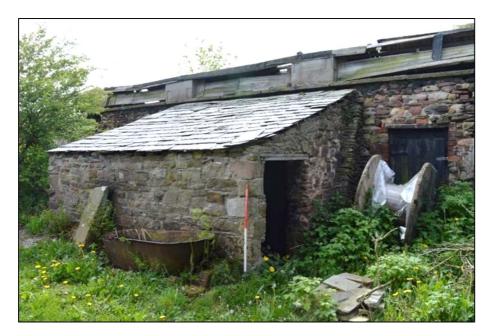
(Shot 113): Lean-to Building 9 and adjoining Wall 7, looking southeast (1m scale)
